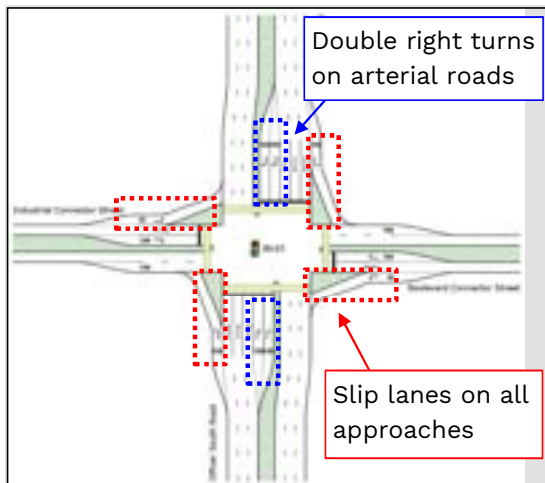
IN-01 intersection layout, as per Ratio ITA and the VicRoads design layout
